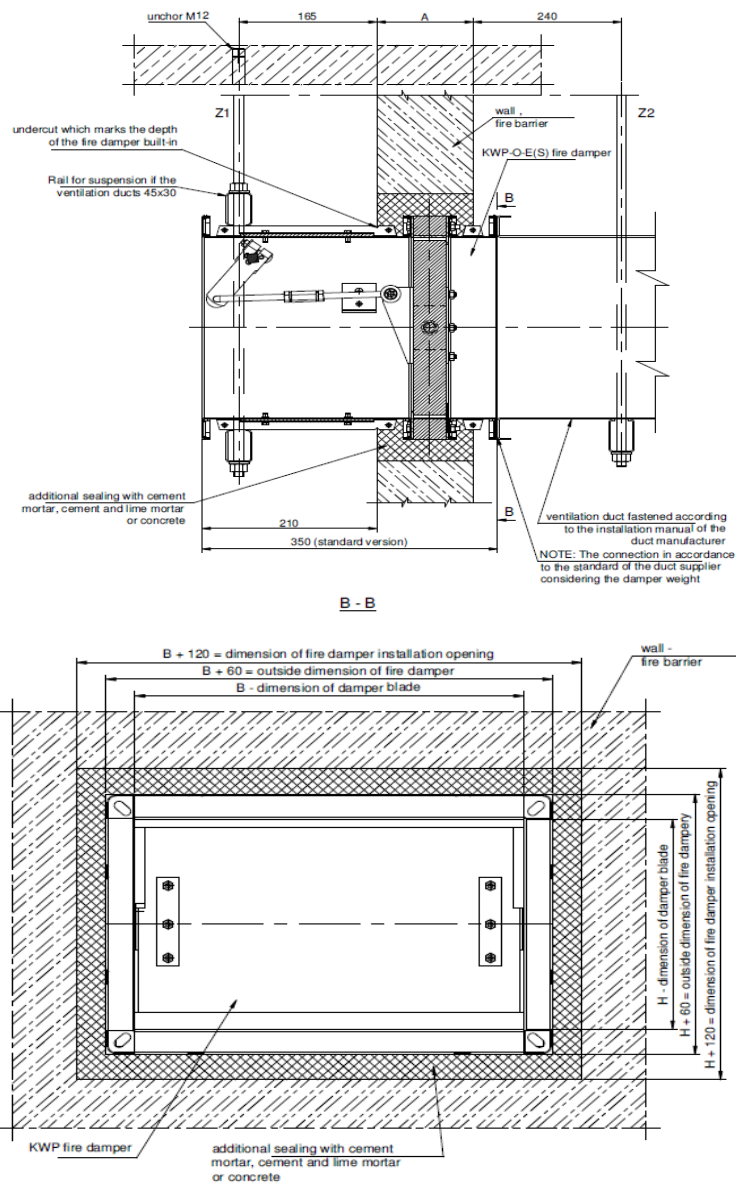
Installation method of fire damper KWP-O-(E)S in rigid compartment – wall
